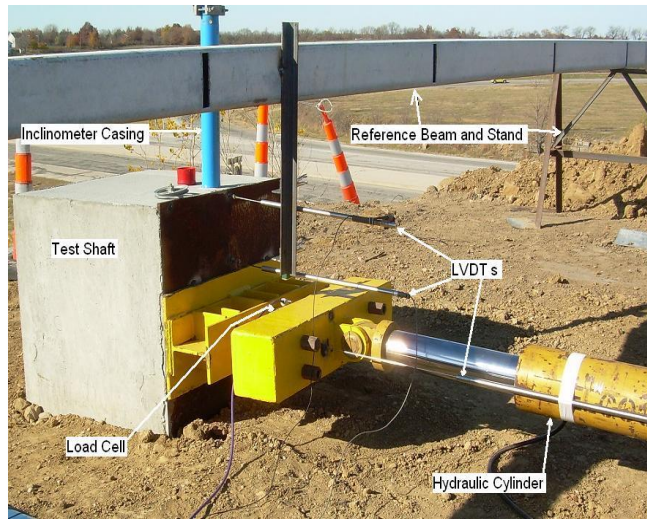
Installation of load cells and LVDTs (M. C. Pierson et al., 2009)
